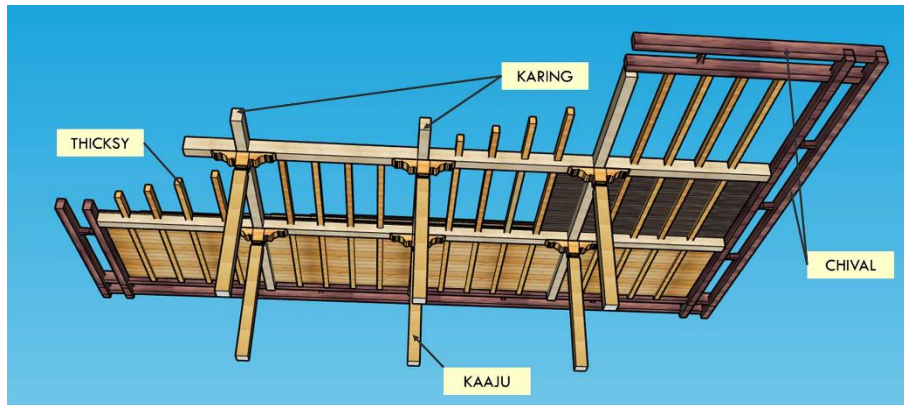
Four Pillar (Kabzi) layout in planning (Source - Author)
